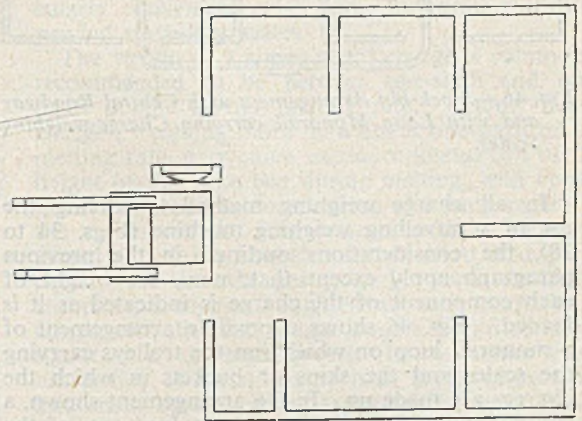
Bins containing Working Stocks grouped around fixed Weighing Point at Foot of Skip Hoist.
